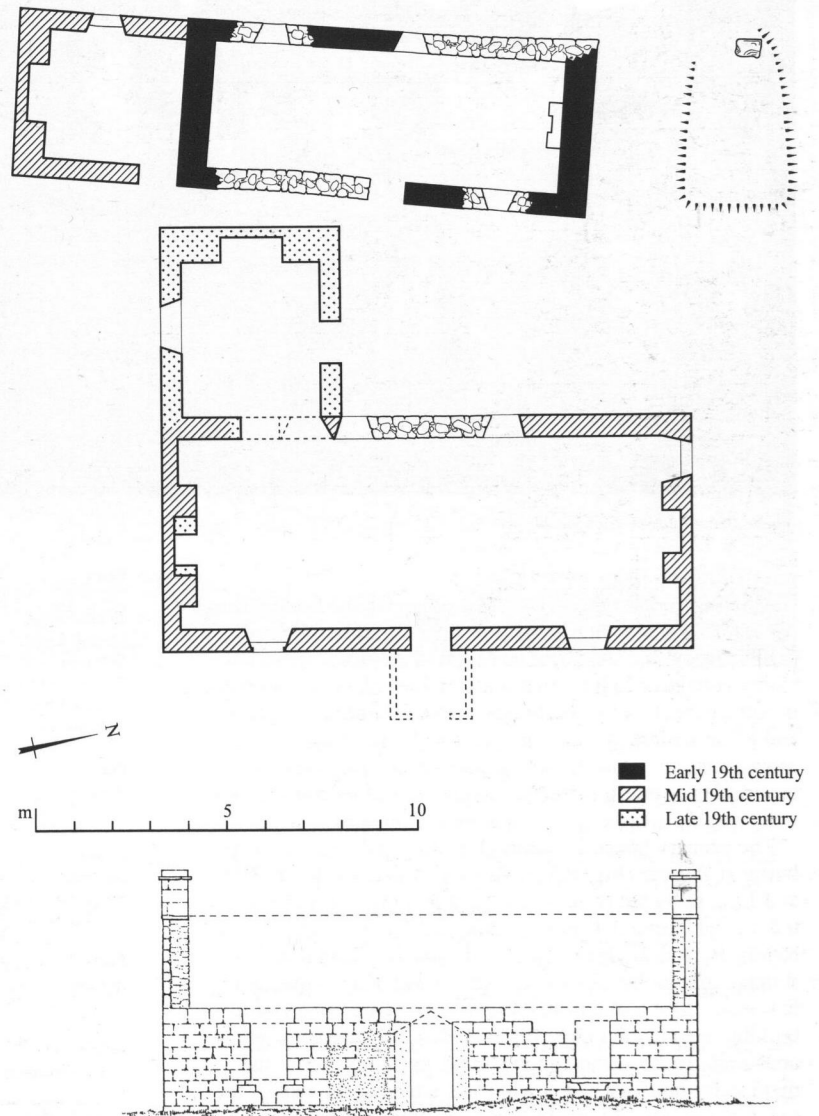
Bynack Lodge: plan (1:200) and east elevation of mid-19th century lodge
